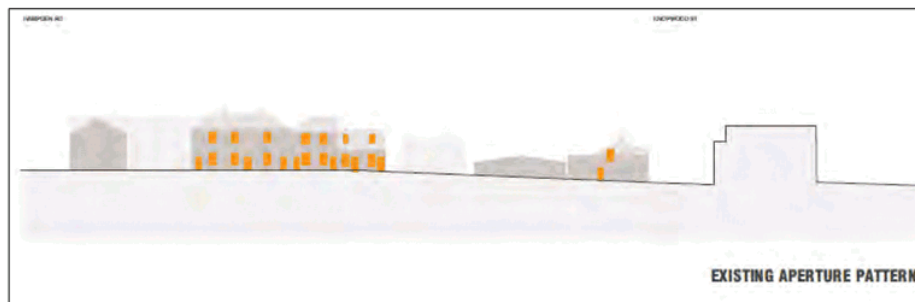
Existing built form and fenestration along James Street (source: FK Architects)
